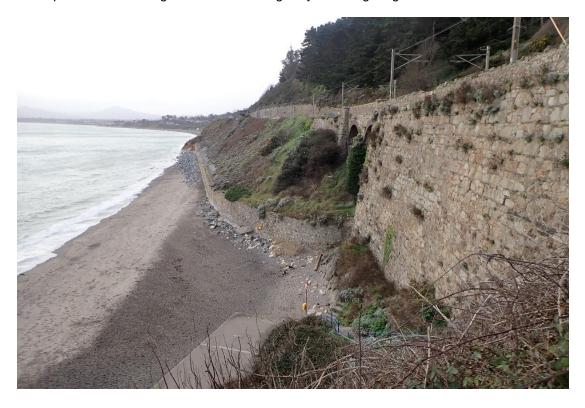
View of railway retaining wall and embankment at White Rock beach, north of the project area.
